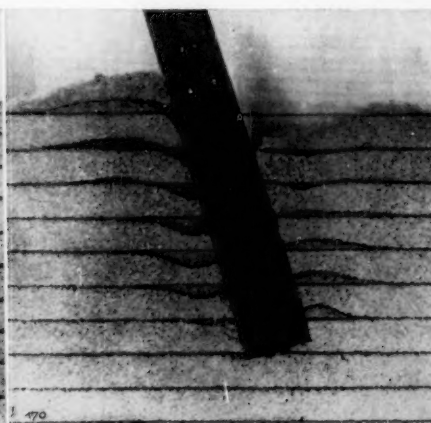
Horizontal Layers Deformed by Overturning Wall.
